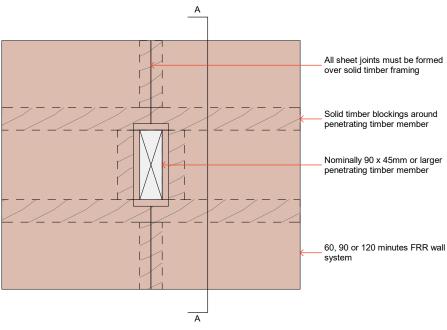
60 minutes or higher FRR wall systems timber penetration details
